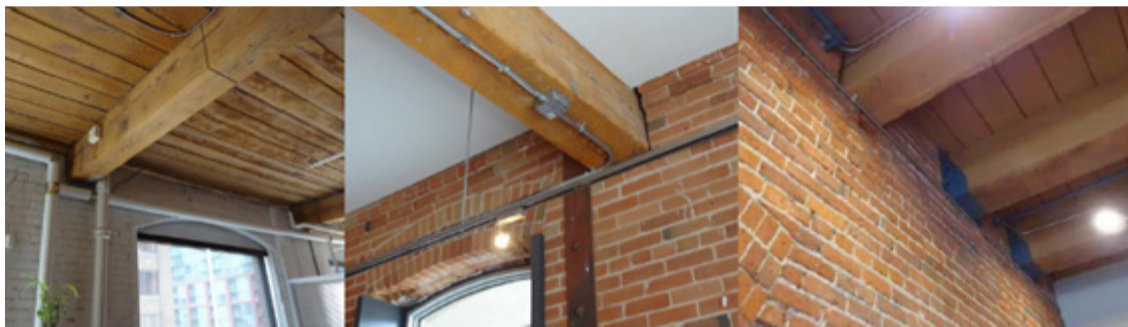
Typical brick and beam building connections (Koo, 2013). Beams are directly connected to the brick, with no indication of differential shrinkage accommodation.
